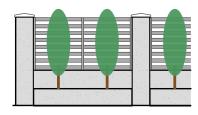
Semi-permeable fencing – rendered masonry pier with low wall, integrated planter and permeable infill panels above
